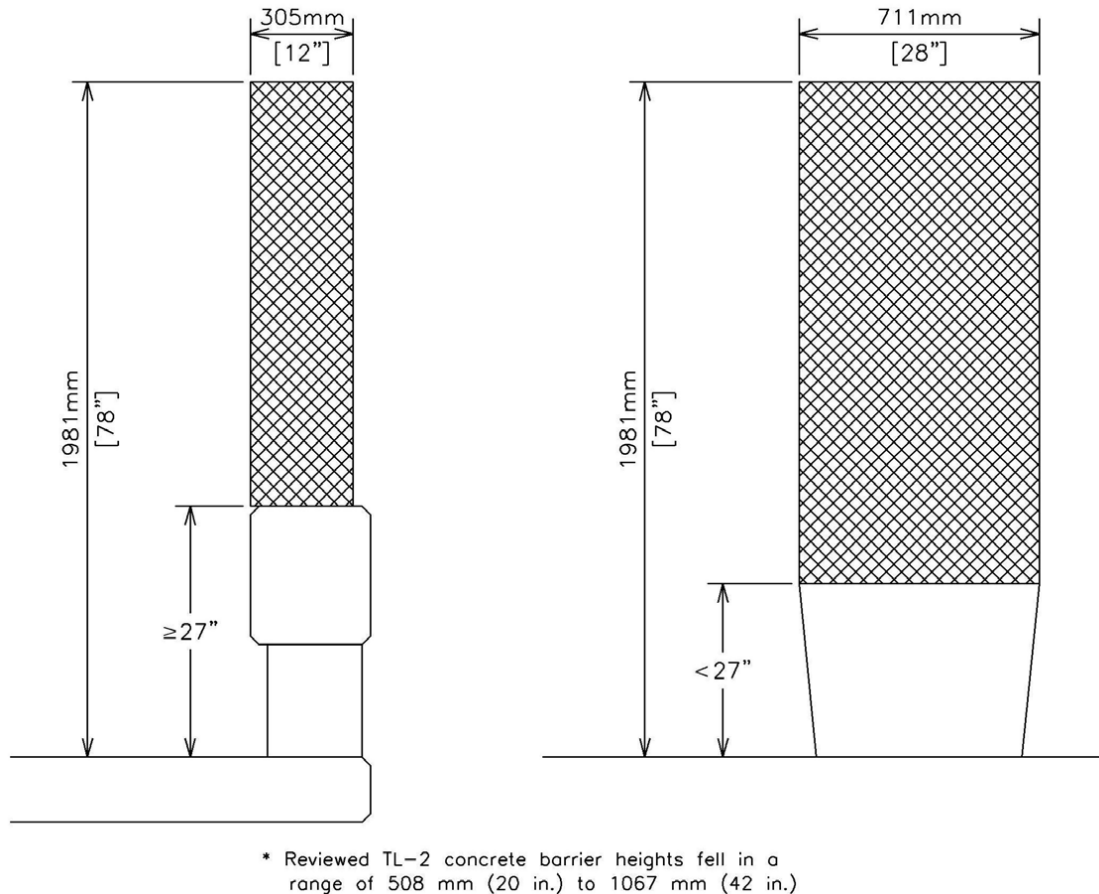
Intrusion Zones for Tall TL-2 Barriers ≥ 27 in. (686 mm) and for Short TL-2 Barriers < 27 in. (686 mm) [32]
